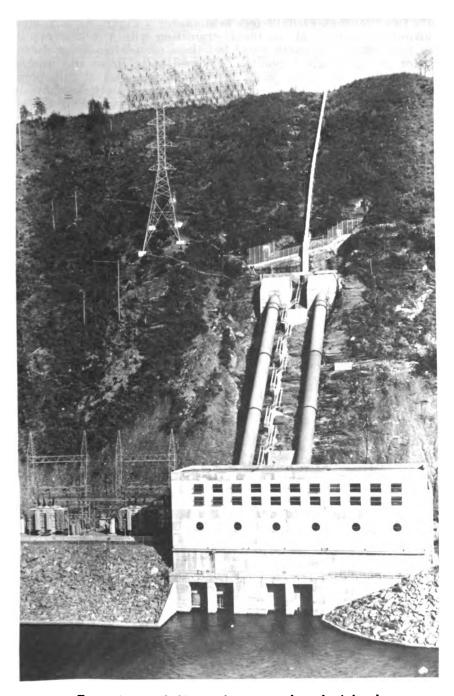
Apalachia powerhouse, penstocks, and switchyard.
